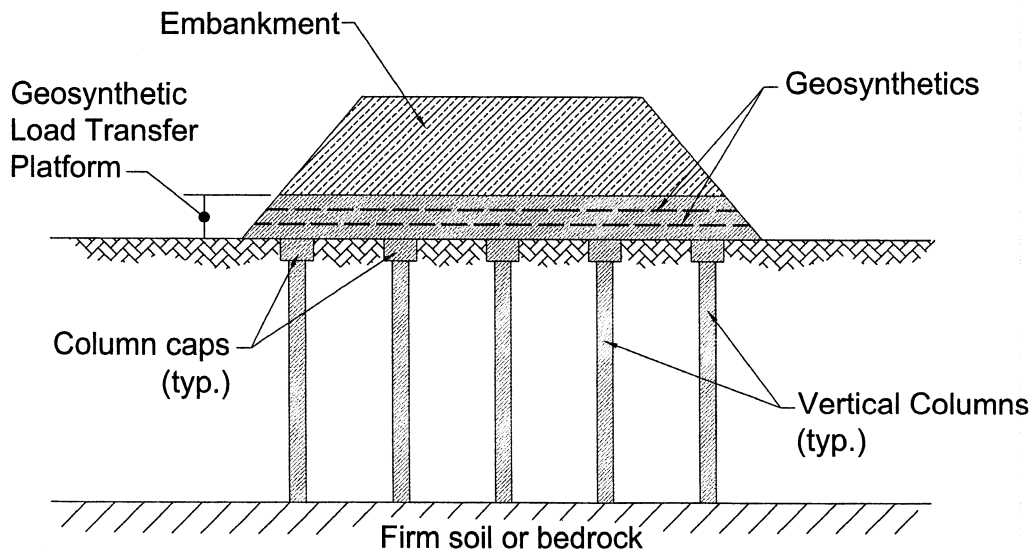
Geosynthetic Reinforced Column Supported Embankment.
